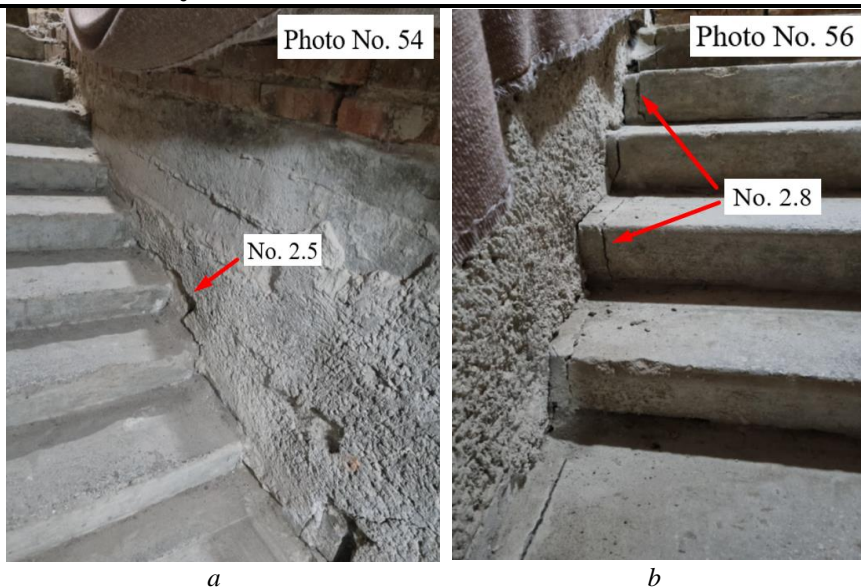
Cracks in the foundation (a) and in the stair flights (b)
